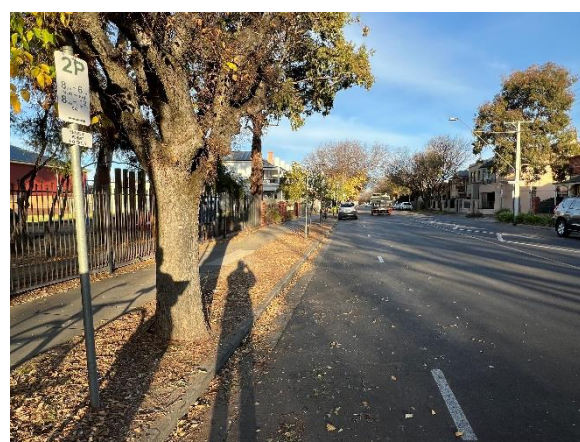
On-street Parking and Kiss and Drop Areas for North Adelaide Primary School
